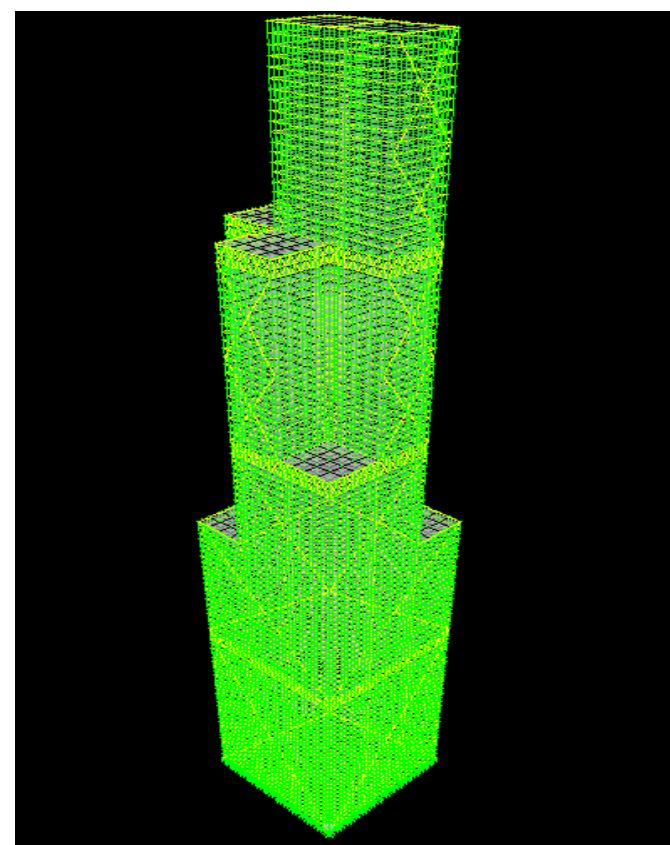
3-D view of steel bundled tube structure with belt truss and mega bracing.
